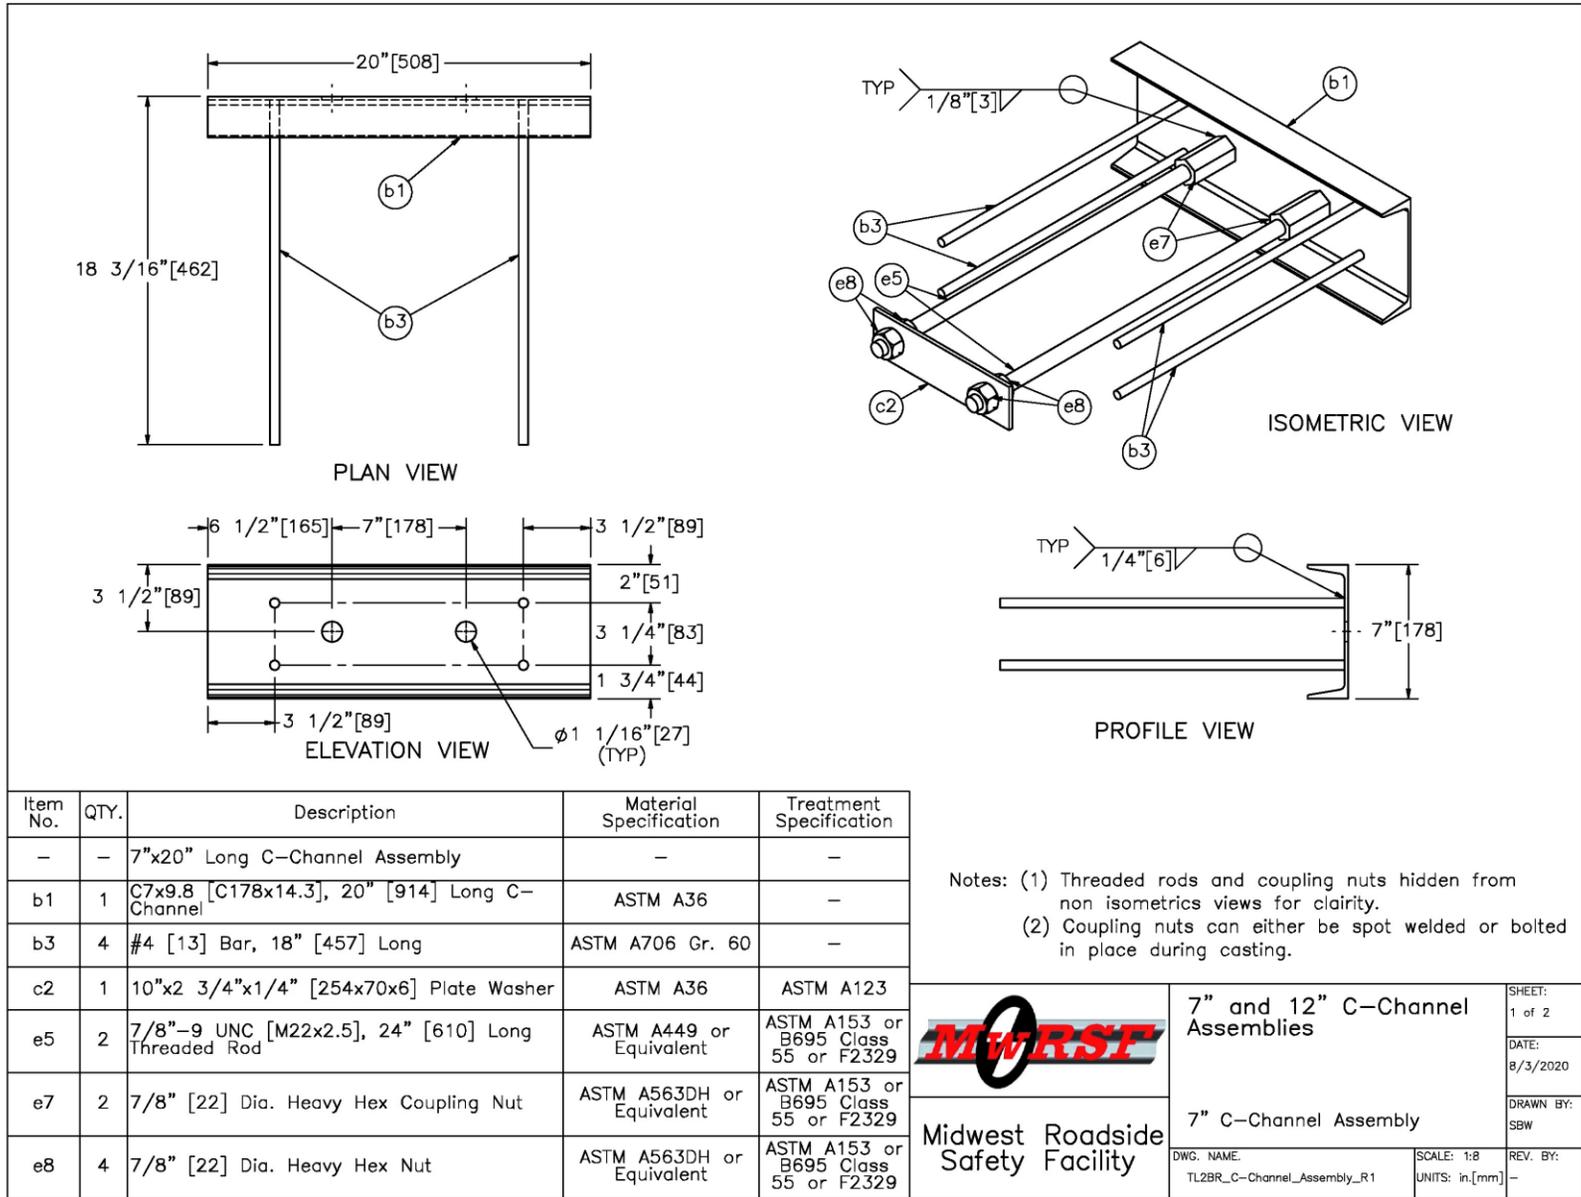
Details for 20-in. Long C7x9.8 Channel Assembly for Use on 7-in. CIP decks
